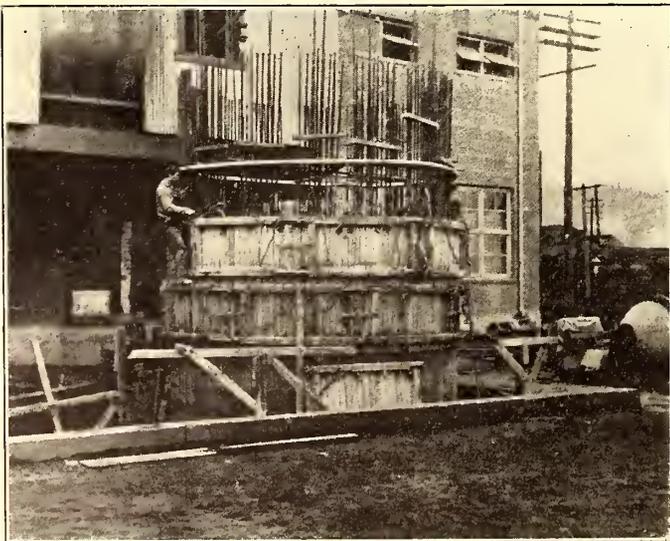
VIEW OF CONCRETE CHIMNEY IN COURSE OF CONSTRUCTION
